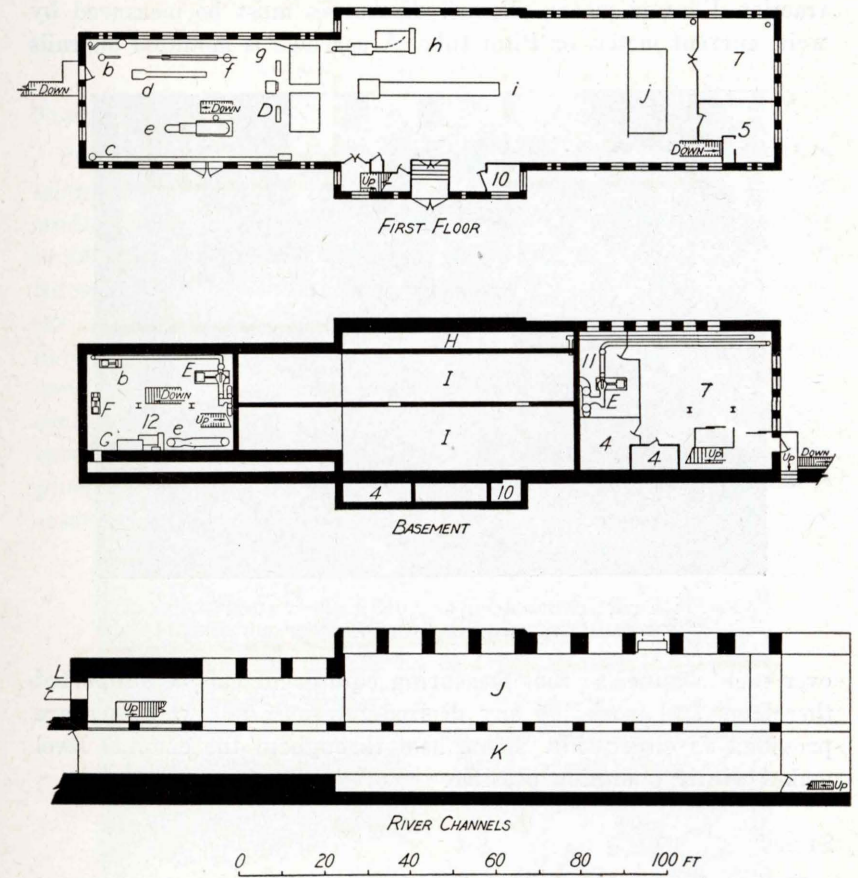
PLAN VIEWS OF RIVER CHANNELS, BASEMENT, AND FIRST FLOOR.
